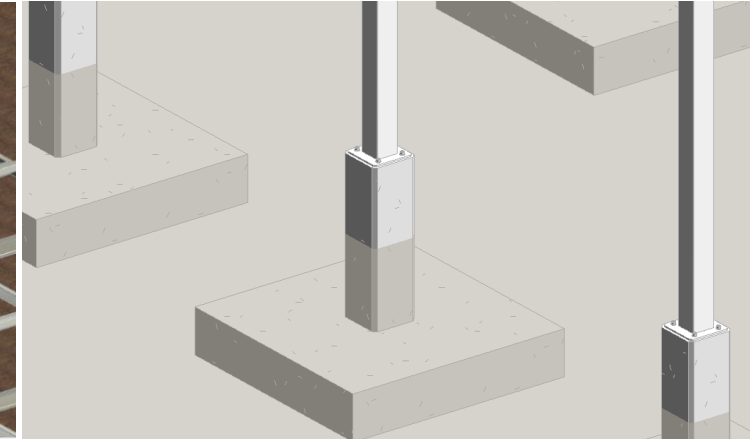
Pergola connection footing and stub column rendered image (Author, 2022)
